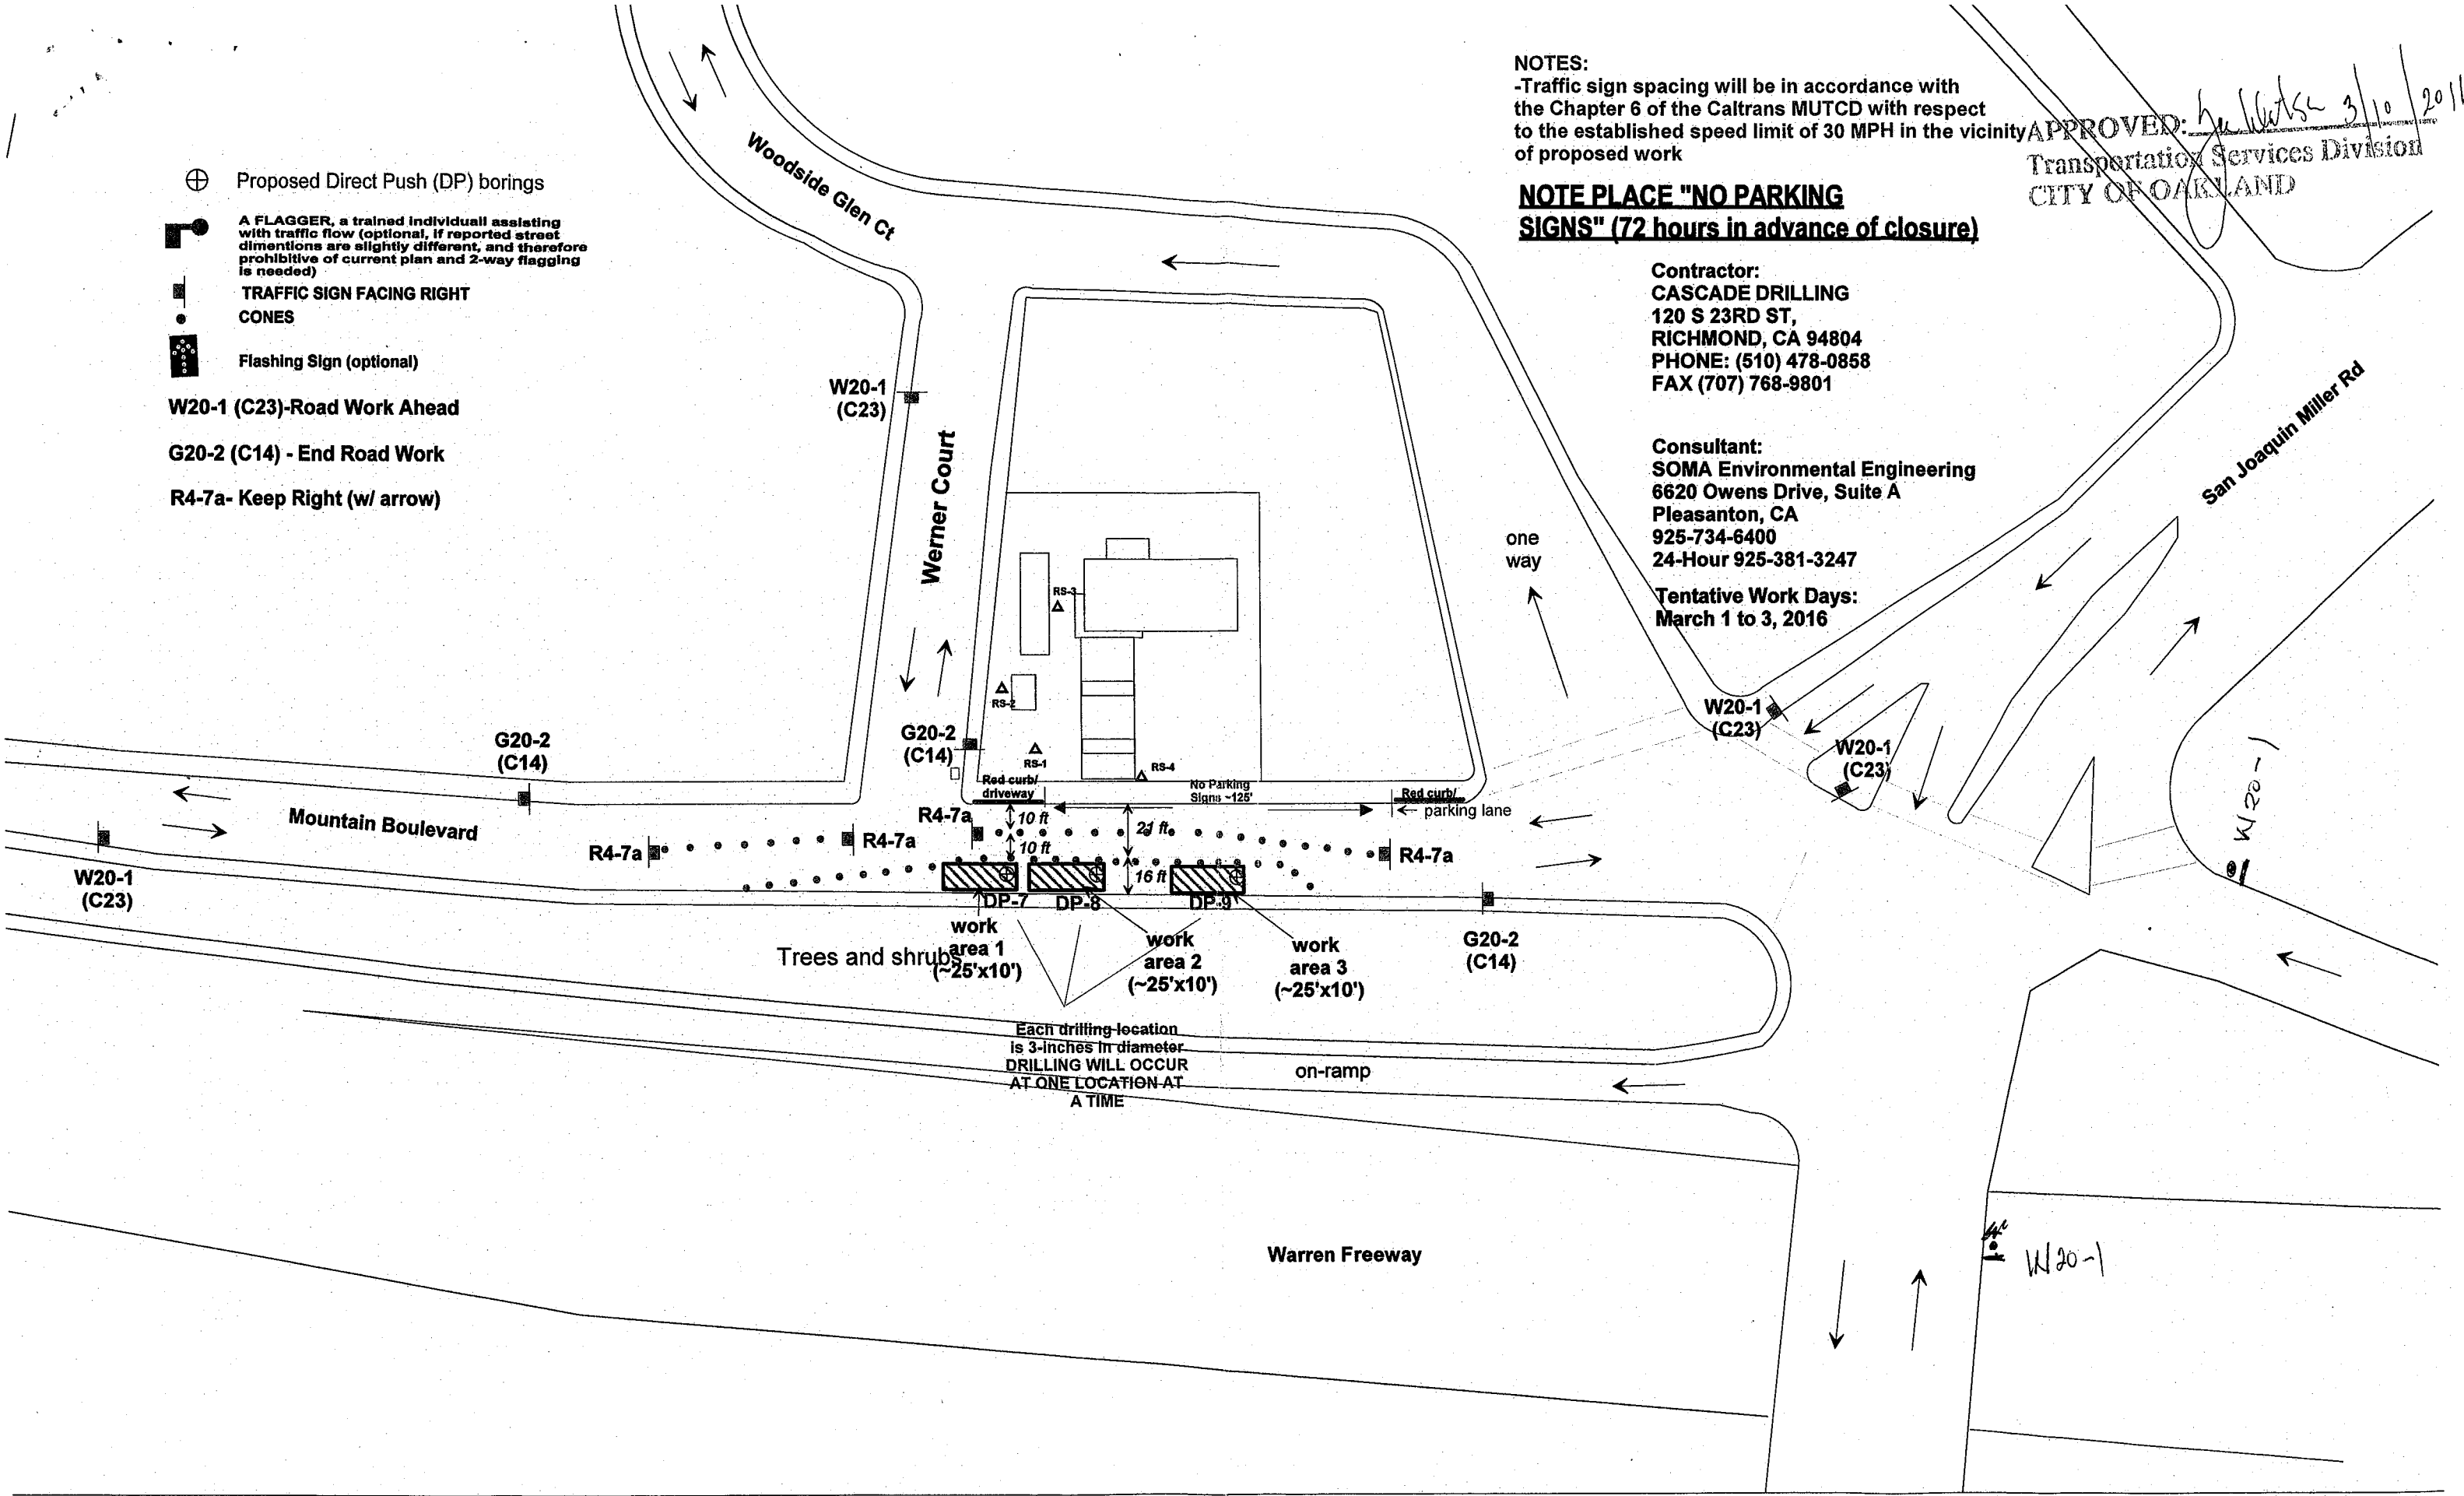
Traffic Control Plan for Proposed Drilling Locations
